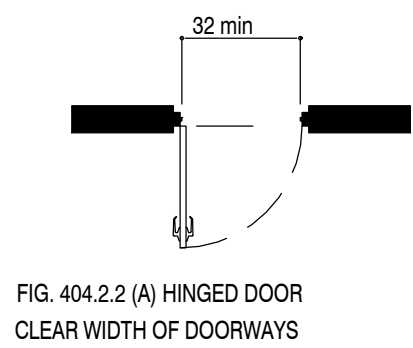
(A) HINGED DOOR CLEAR WIDTH OF DOORWAYS
